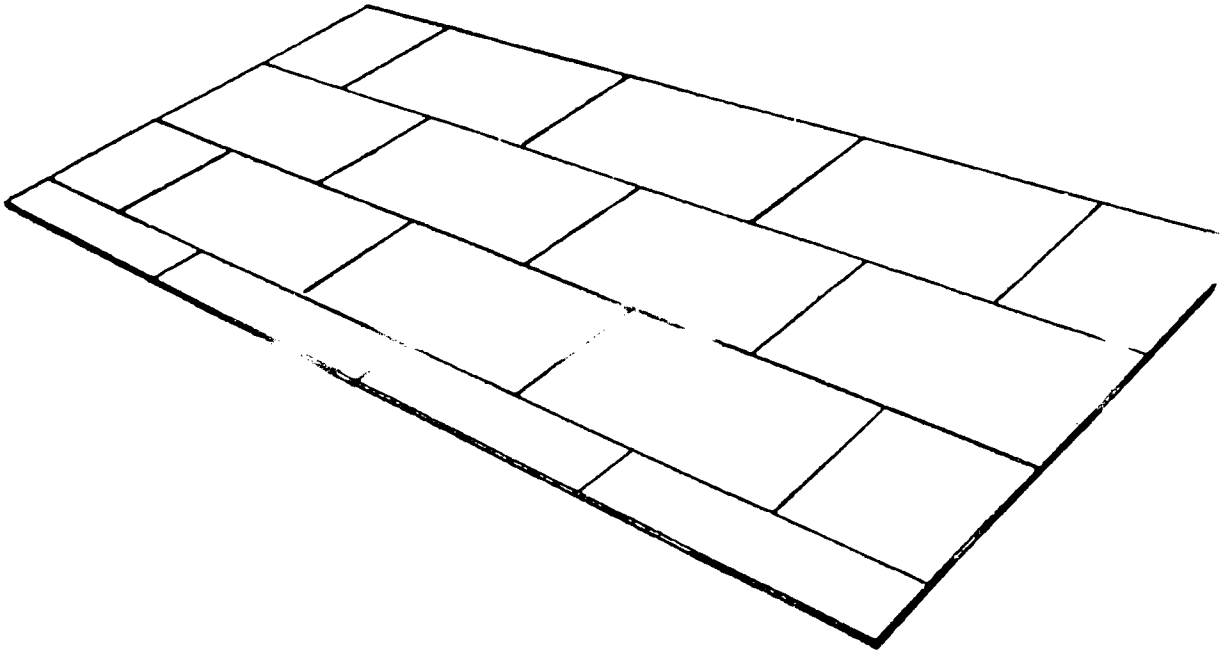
Typical Roof Deck Pattern Using Plywood Sheets
